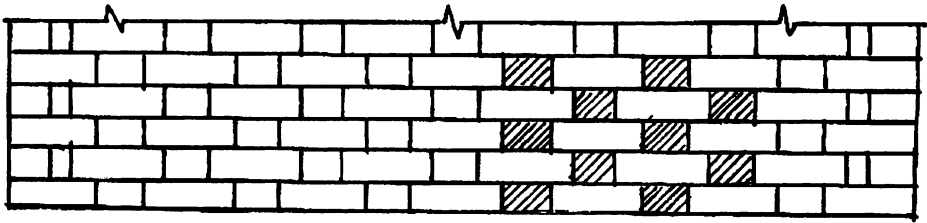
Brickwork Flemish bond (elevation) – alternate stretchers and headers in the same course.
